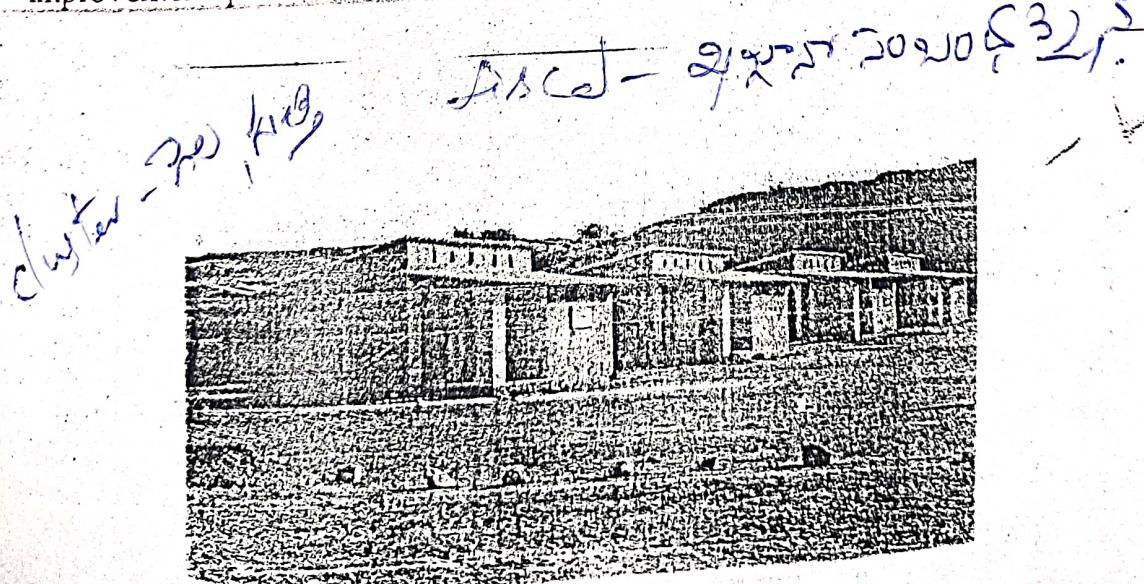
NBO cluster demonstration rural houses in a Gujarat village constructed in stone masonry
